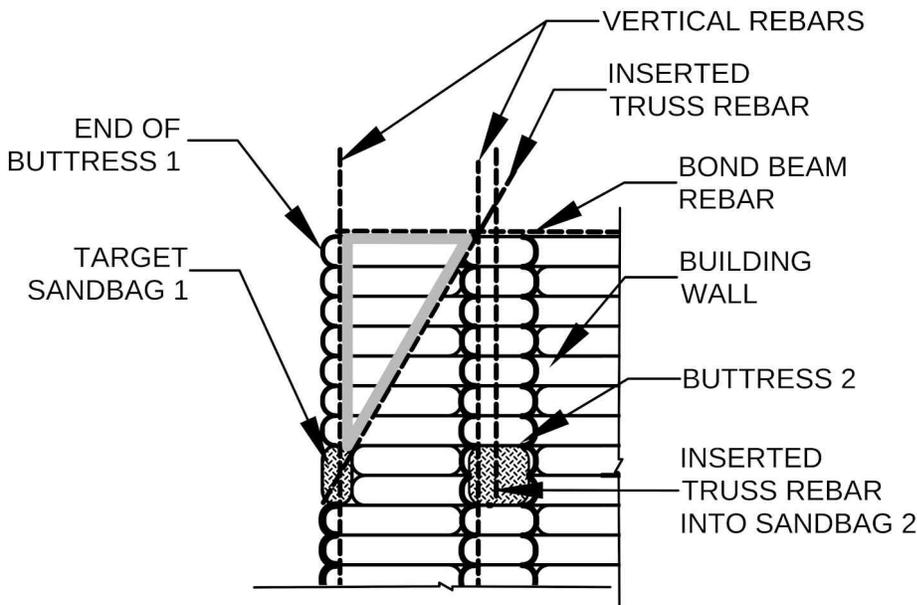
Standard grade reinforcement uses triangular bracing at external corners or buttresses.
